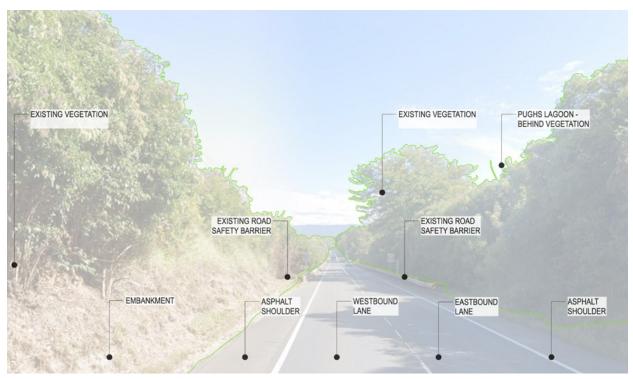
Viewpoint 5 - Existing view on Kurrajong Road looking north towards Pughs Lagoon
